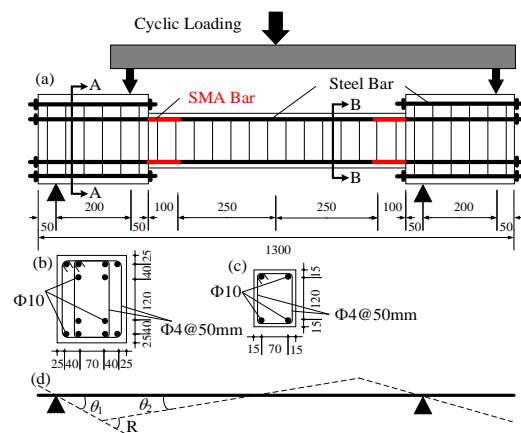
a) Test set-up; b) beam section (A-A); c) beam section (B-B) and d) deformed shape (dimensions in mm)
